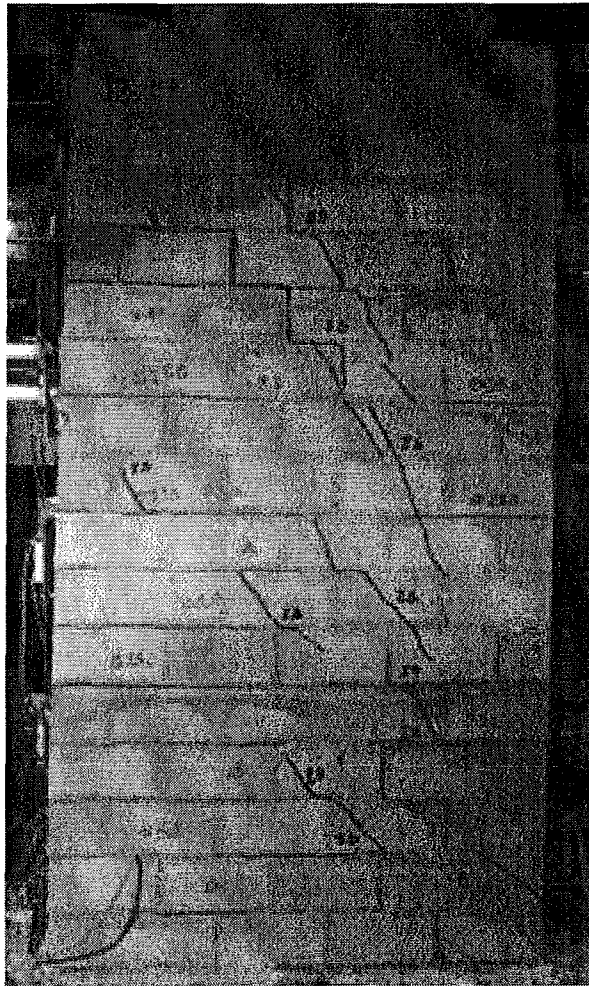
Wall 2 – Bed Joint Cracking at  $\Delta_y$
